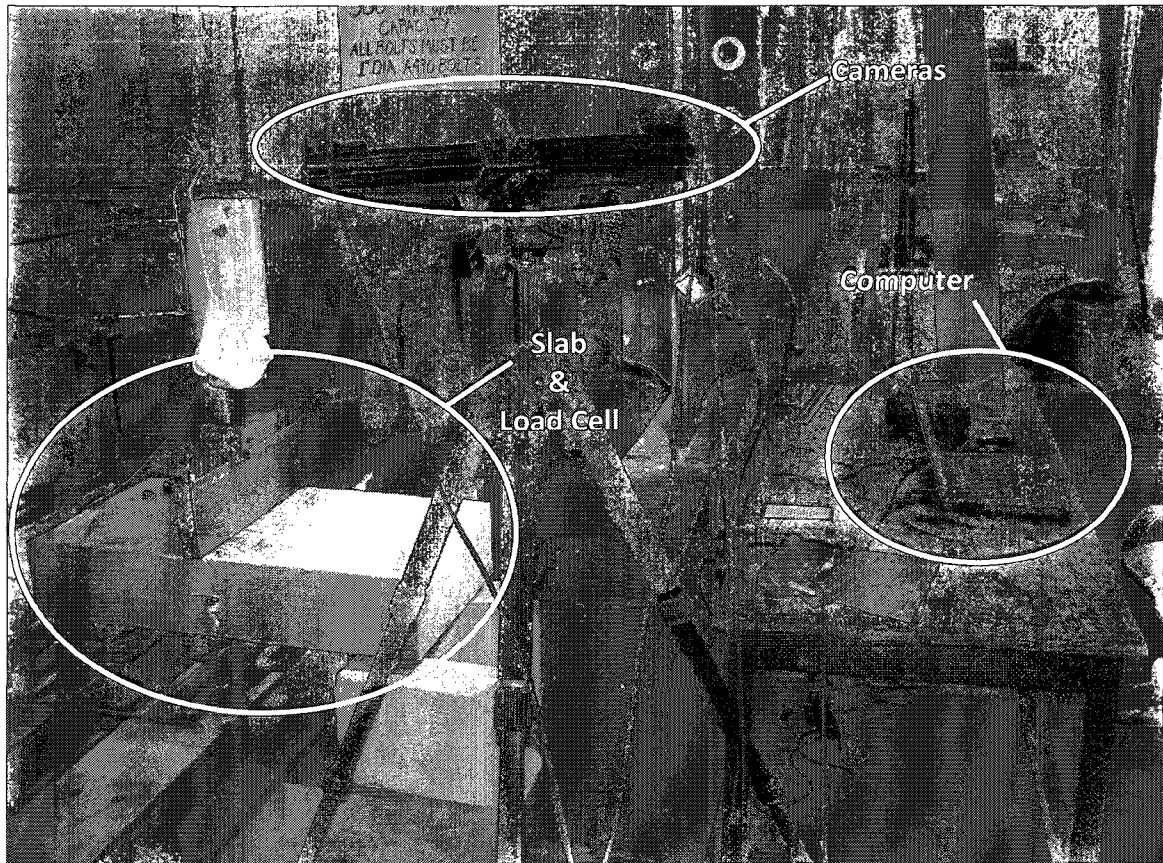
Slab test DIC setup with cameras, loaded slab, and computer
